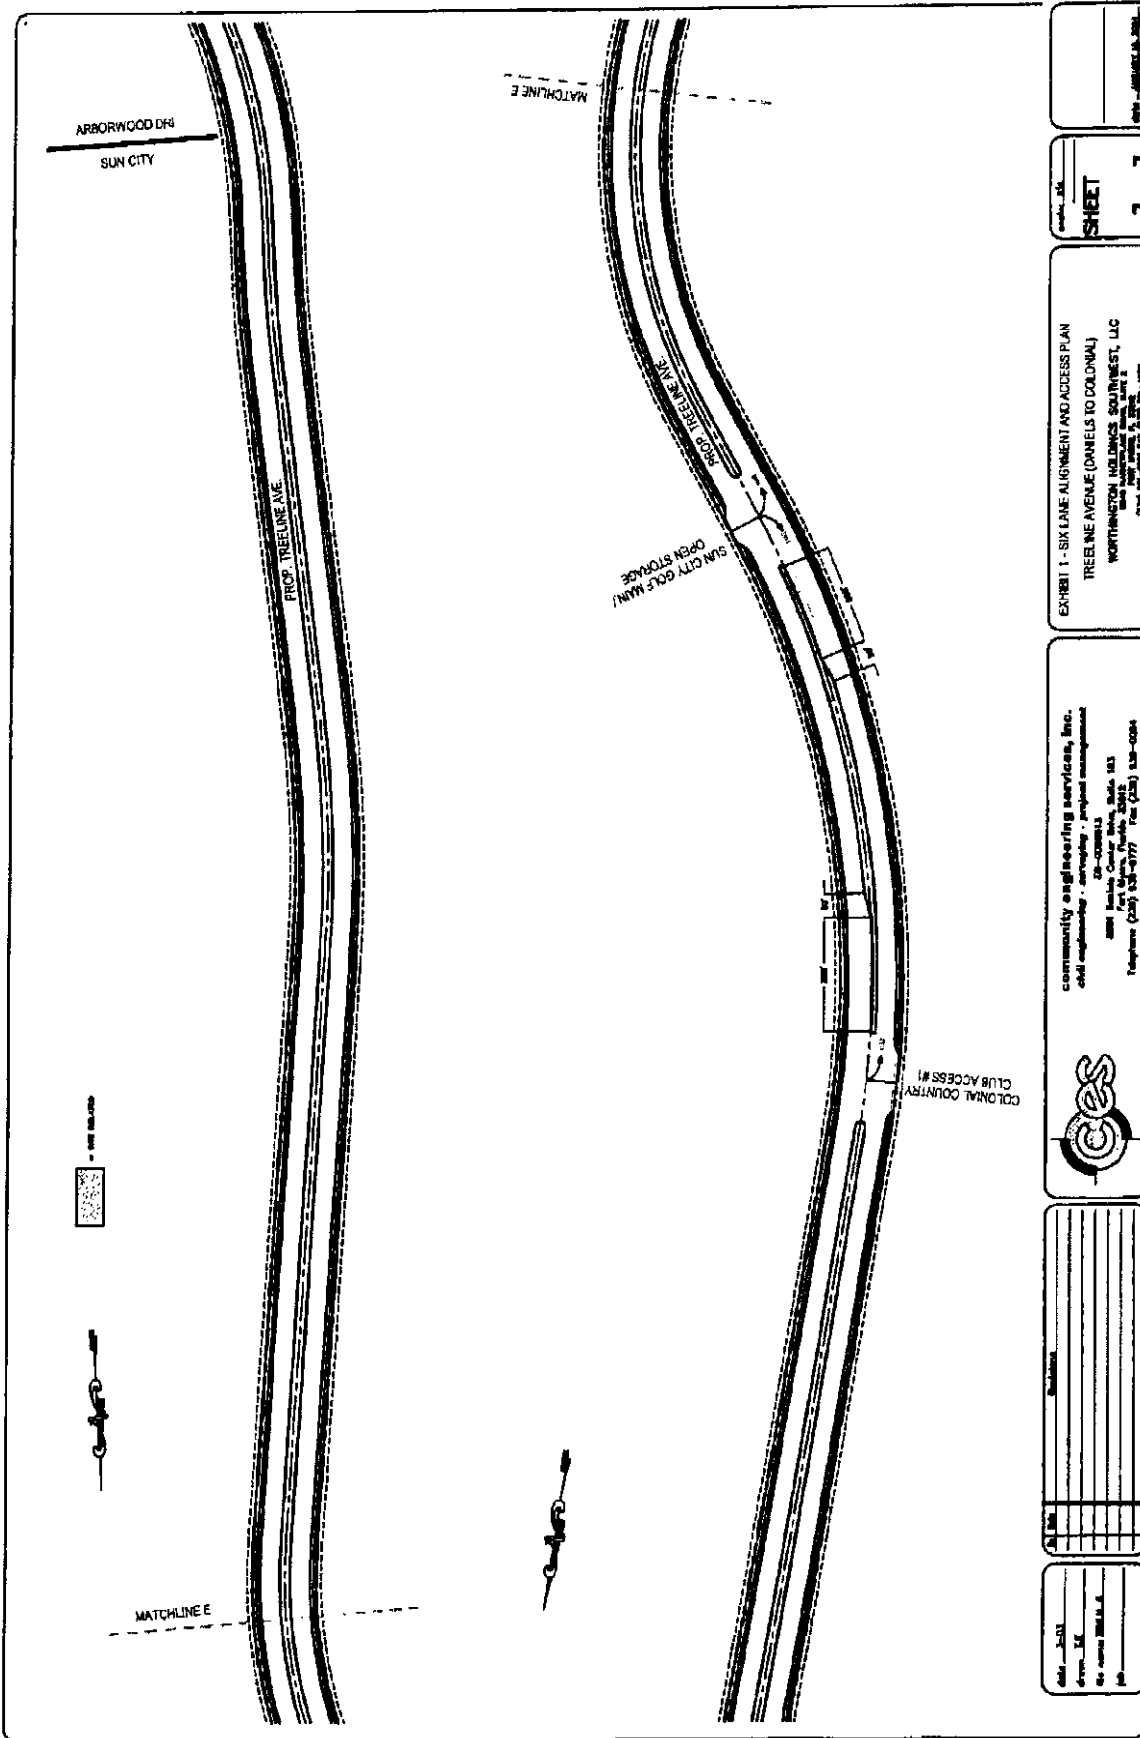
SIX LARK ALIGNMENT AND ACCESS PLAN
